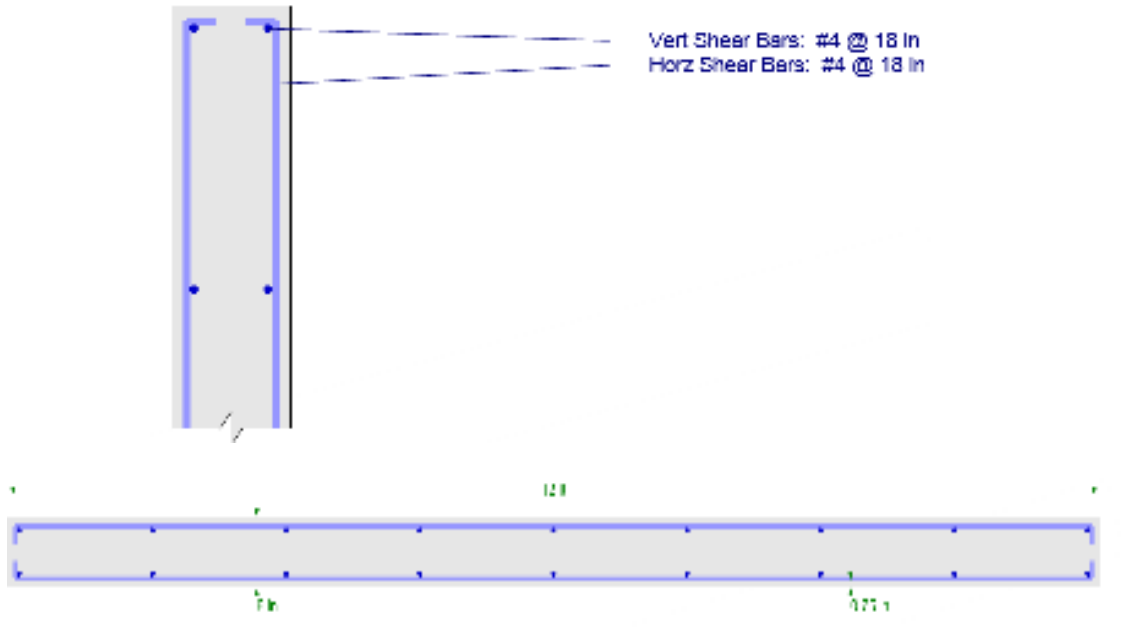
Building (B8-9S-L-O) Ordinary RC Shear Reinforcement Details; Wall Section for Floors 7-9
